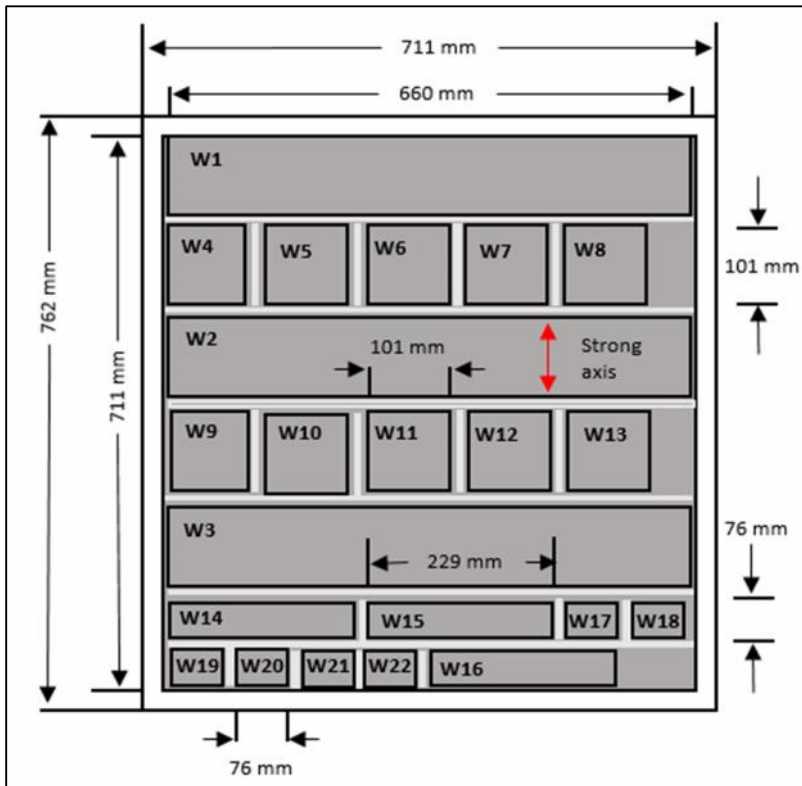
Cutting pattern for weak axis bending, flatwise compression, and connections
